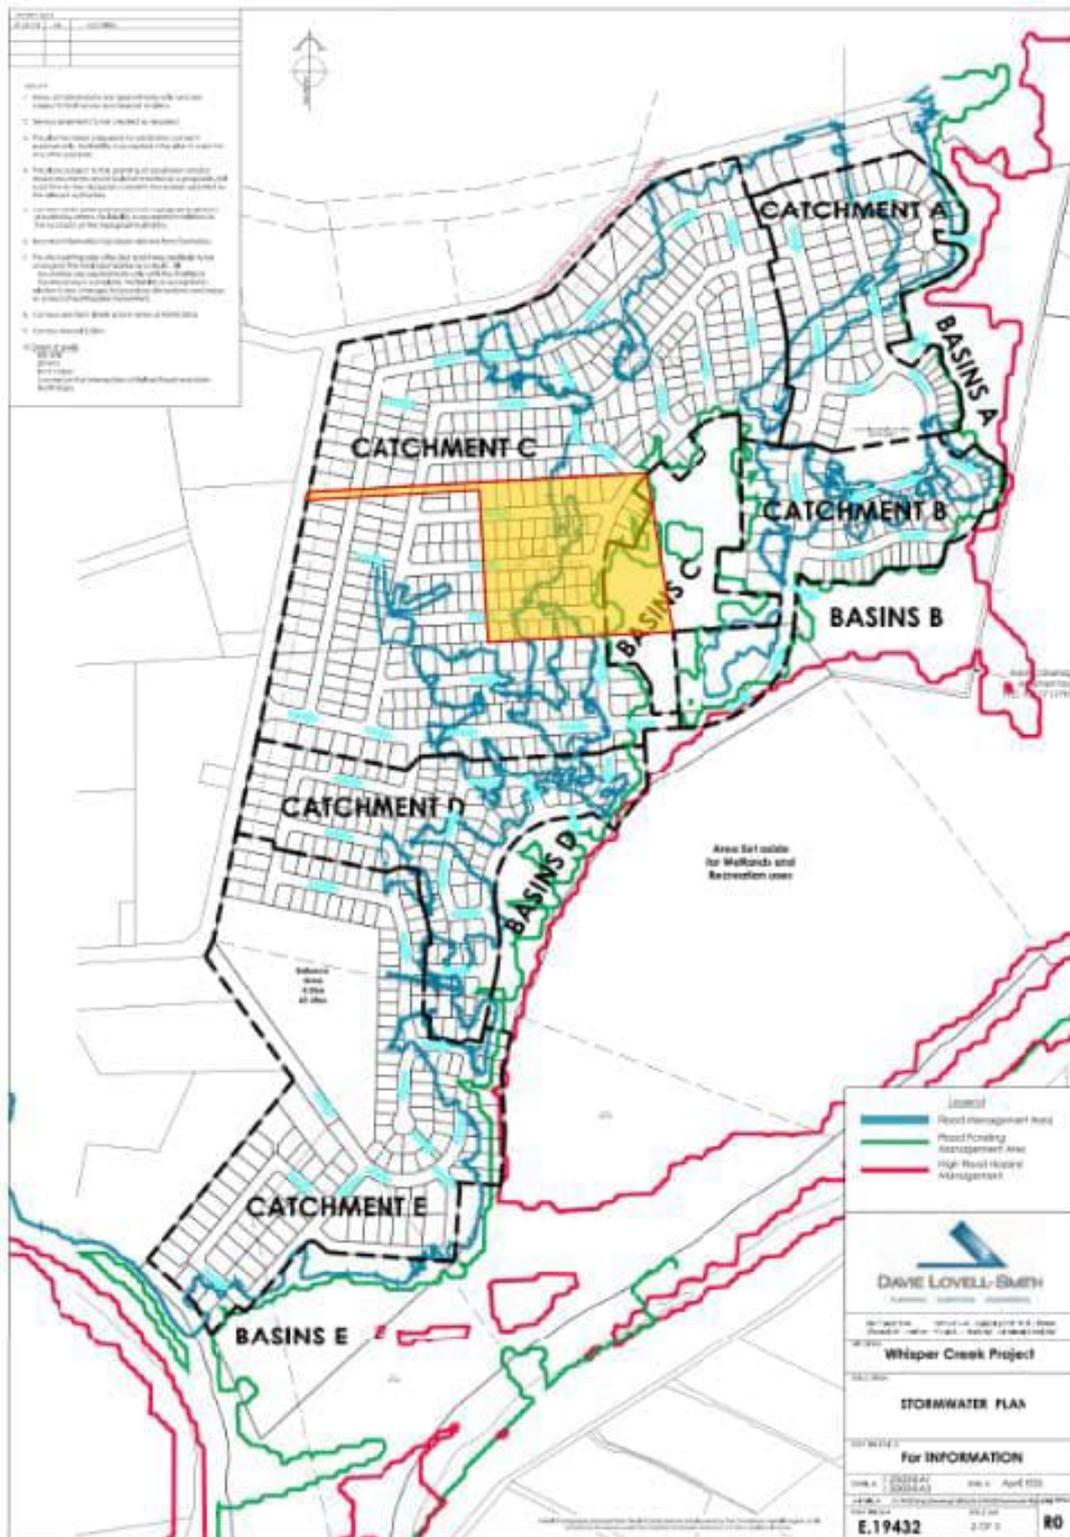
The Location of 176 Turners Road (yellow) in Relation to the Proposed Master Plan under Plan Change 23.
